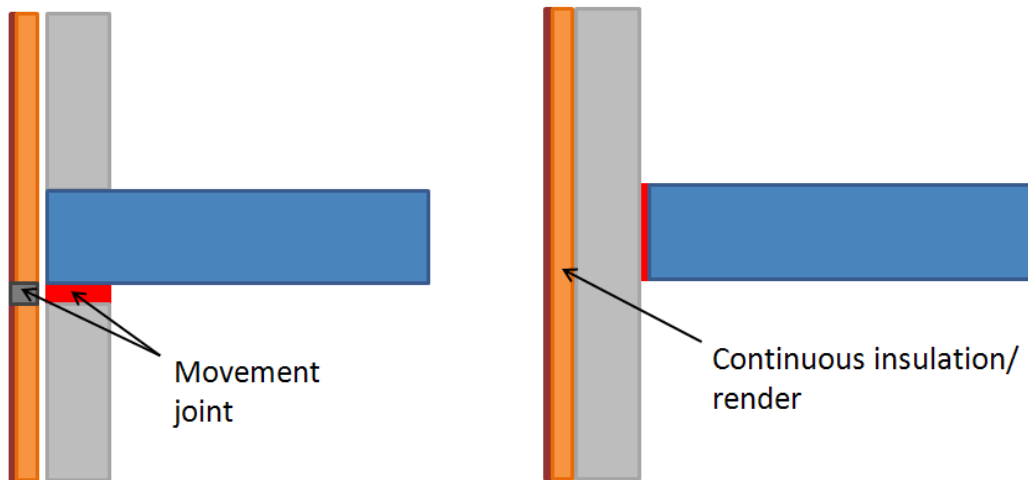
Infill back wall (left), continuous back wall (right)
